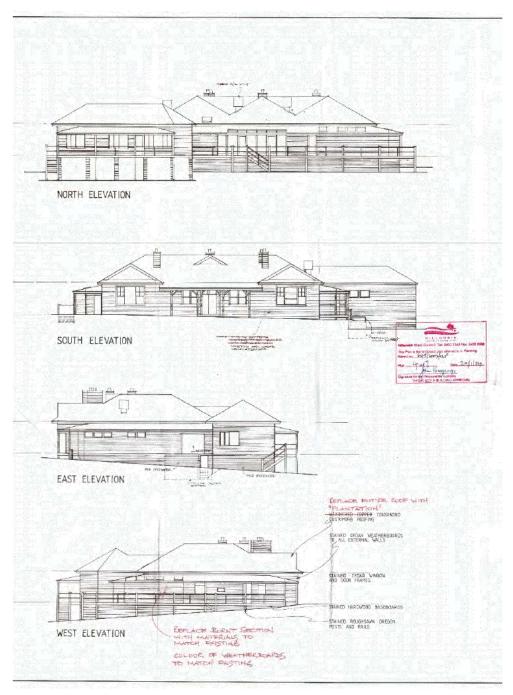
Plans for refurbishment work to the Panton Hill Hotel after fire damage, 2003. (Source: BP).
